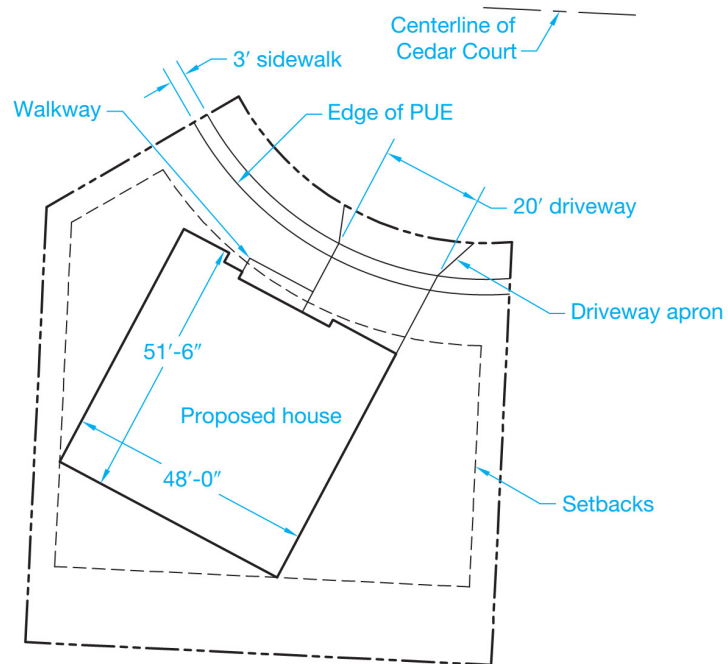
Laying out the structures, roads, driveways, and walks. Be sure the structure is on or within the required minimum setbacks. Use proper CADD layers when drawing the different features of a site plan.
